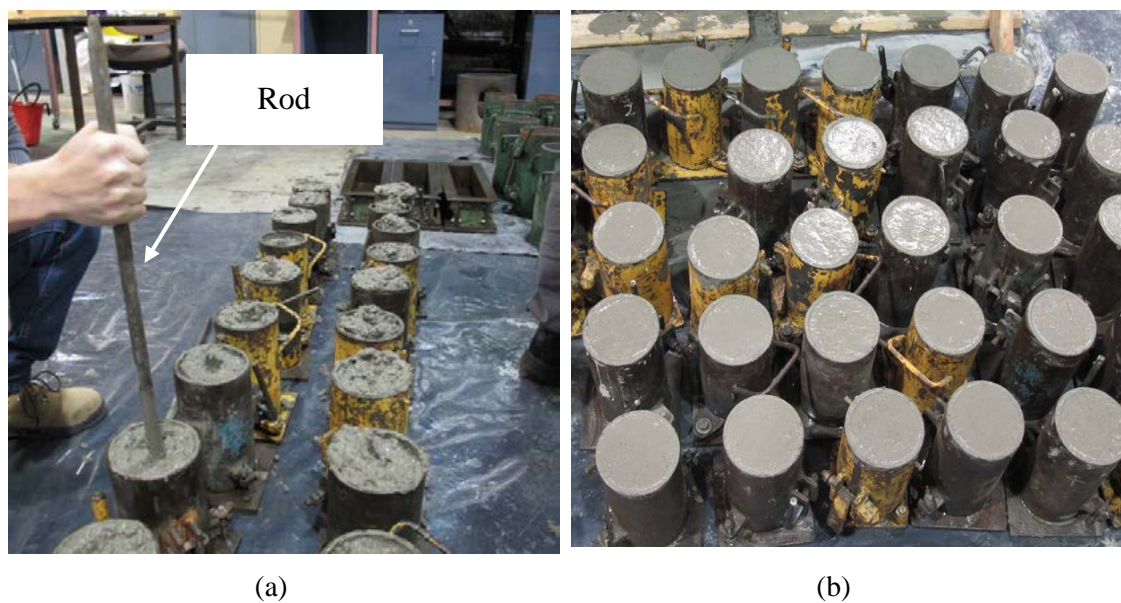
Preparing concrete cylinders for compressive strength test:
